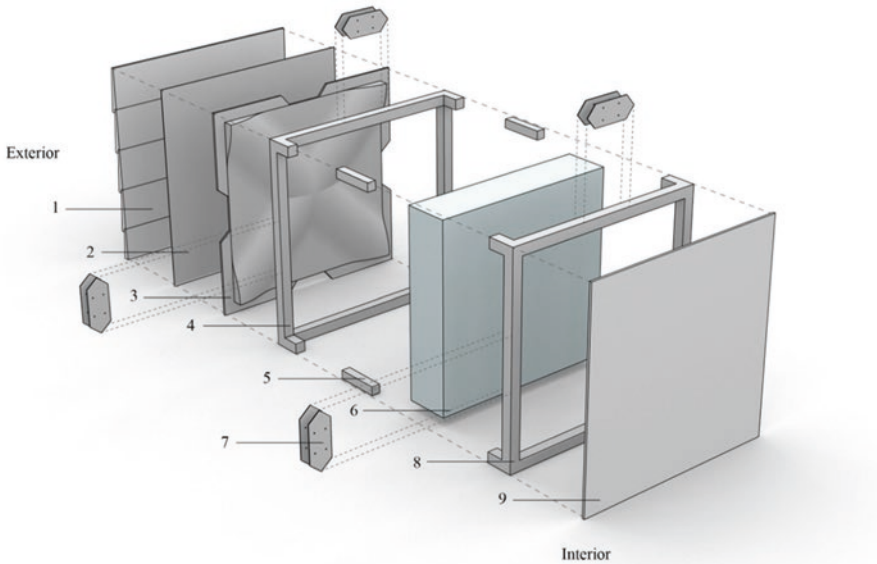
Exploded view of a wall module: (1) exterior siding layer; (2) moisture barrier; (3) soft HDPE sheathing; (4, 8) aluminum structural frame; (5) HDPE thermal break; (6) cotton insulation; (7) stainless steel connection plate; (9) plasterboard
